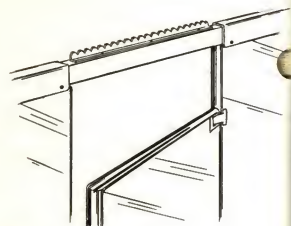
DETAIL OF FLOOR ANCHOR ASSEMBLY, ATTACHED TO SUB FLOOR
